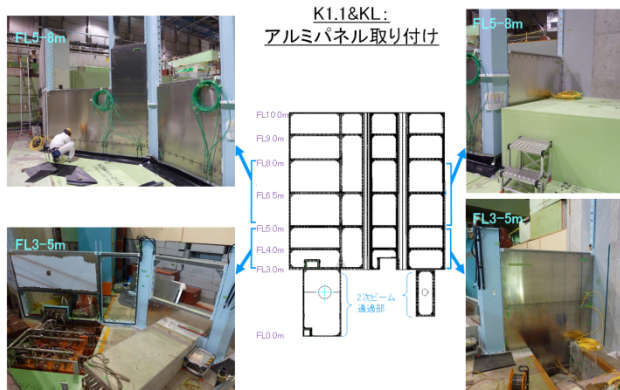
The airtight wall between FL3m and FL8m in K1.1-KL beamline.
